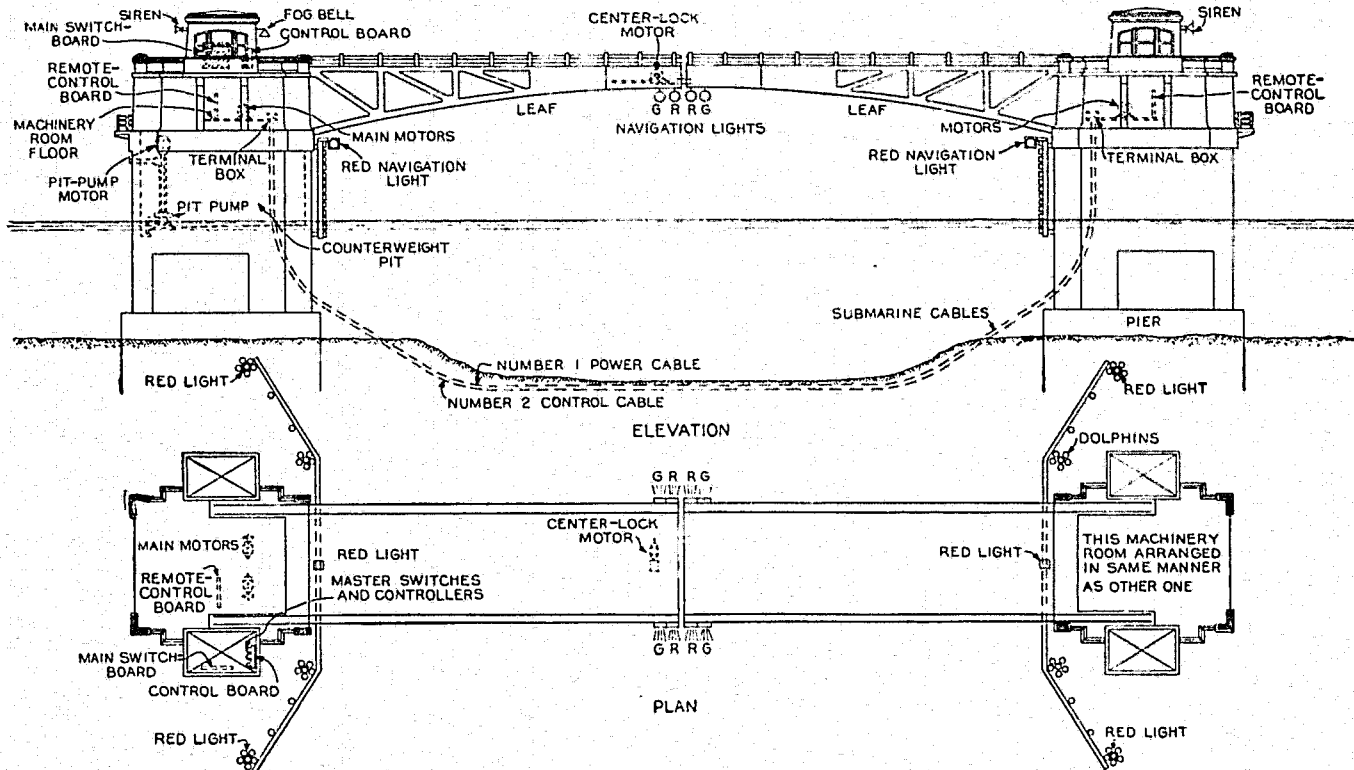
General arrangement of operating and control equipment for a bascule span
